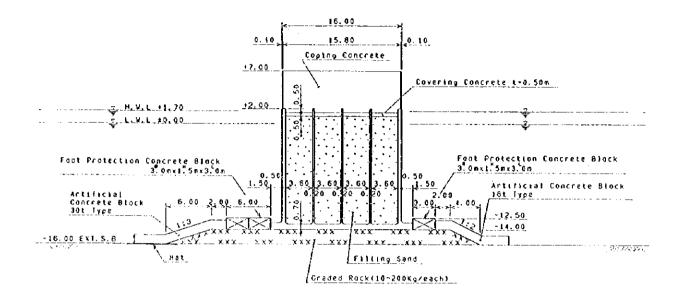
(1) Typical Cross Section of Breakwater 1 (RC Caisson)
